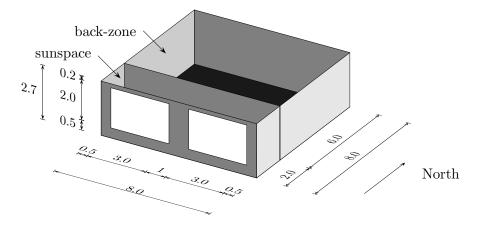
Isometric view of building with sunspace. The roof is not shown.
